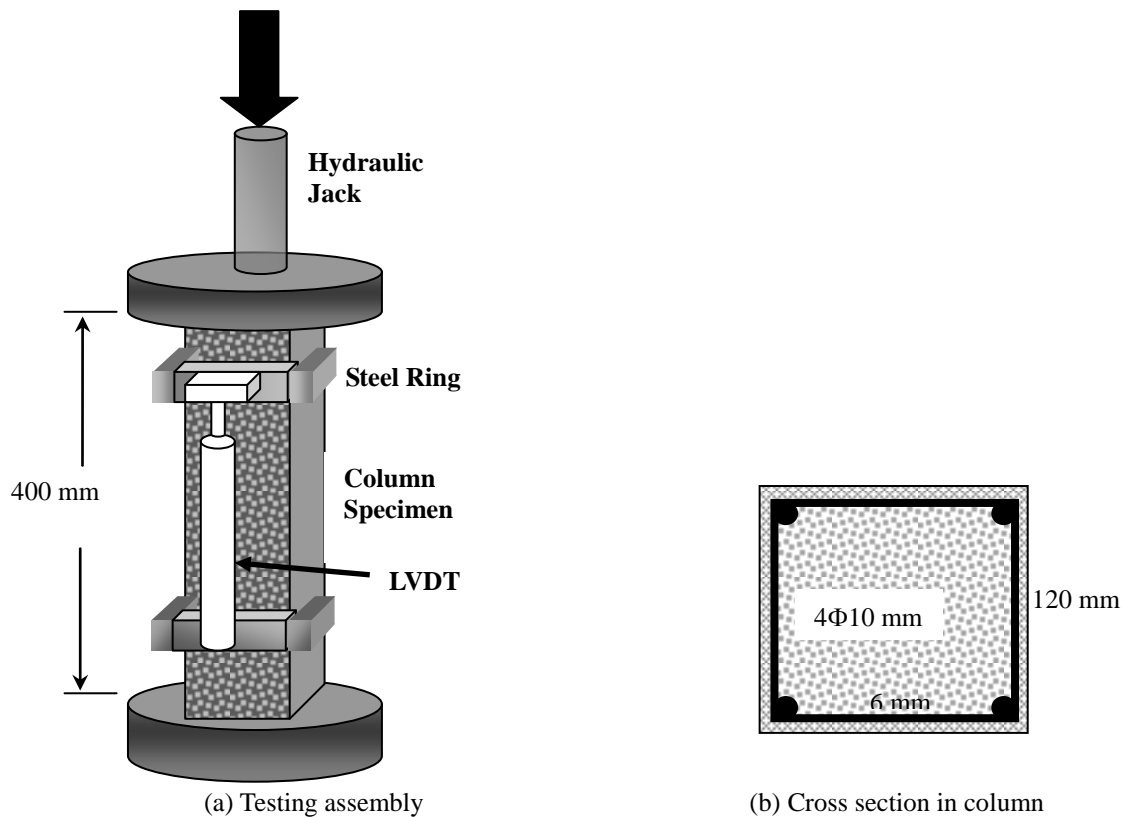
Schematic presentation of testing setup, specimen geometry and reinforcing steel detailing (dimensions in mm)
